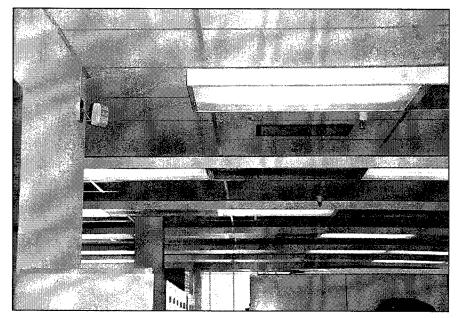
Overhead sprinkler system in the laboratory of ASM's South Building.
